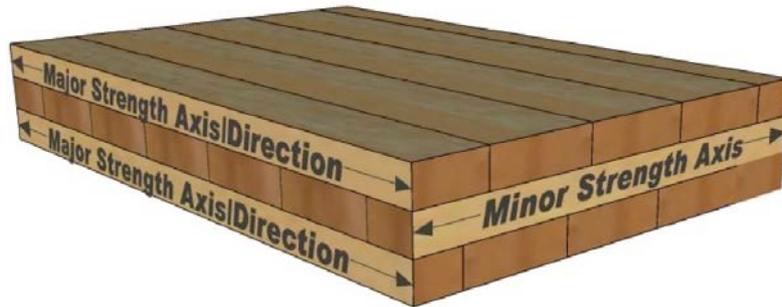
Diagram of cross-laminated timber panel (www.crosslamsolutions.com)
